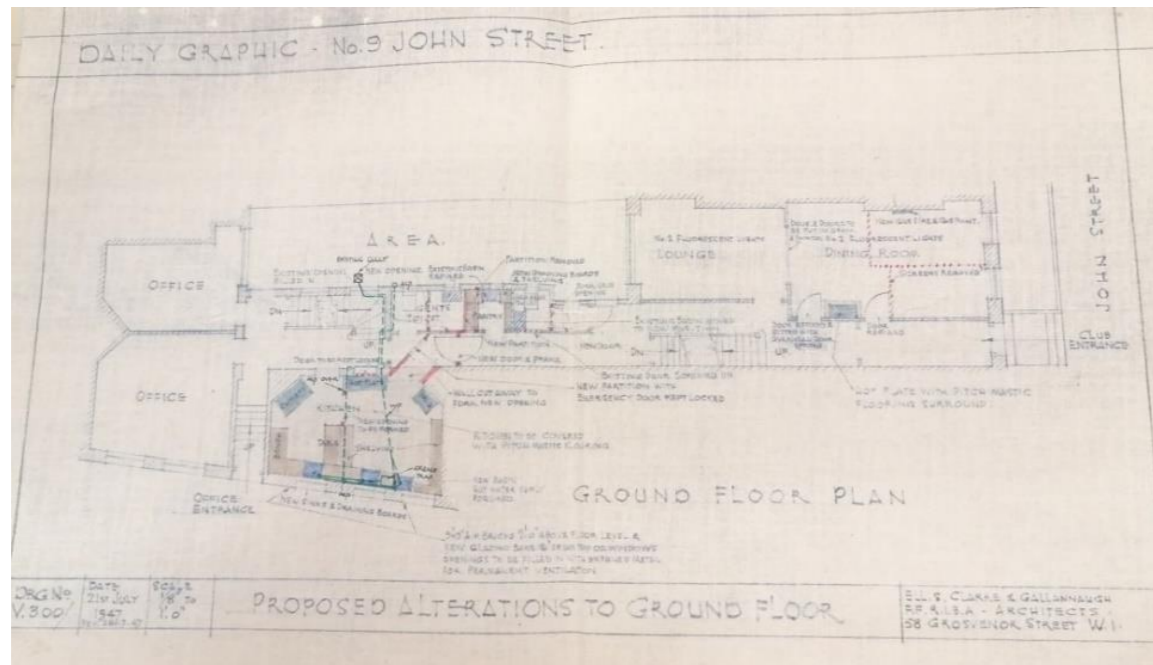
Plan of No. 9 John Street with extension to Northington Street in 1948 [© Camden Local Studies and Archive Centre B/HO/00001/MP/15/362]
